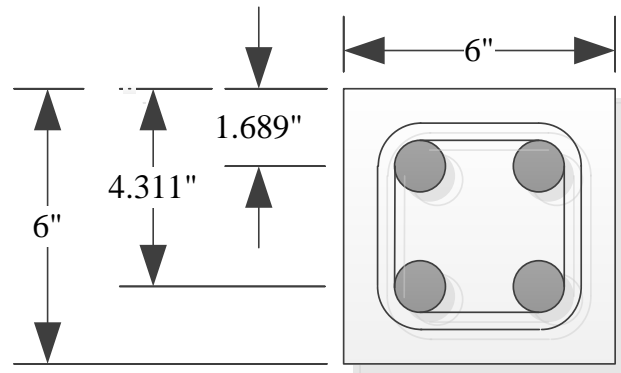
Cross section of MMFX Beam (UHP-FRC #1).
